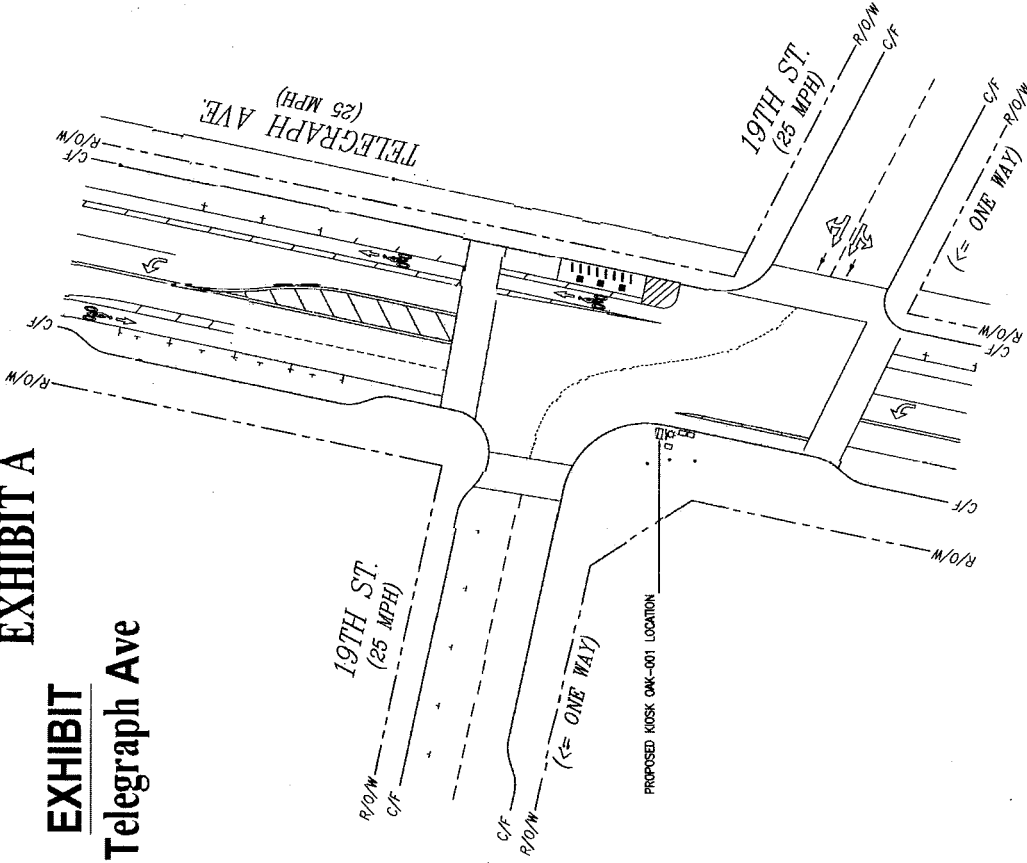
EXHIBIT C: EXAMPLE ENGINEERED SITE PLAN
